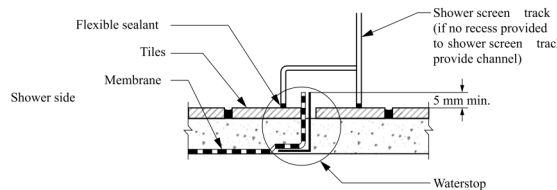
TYPICAL HOBLES CONSTRUCTION
